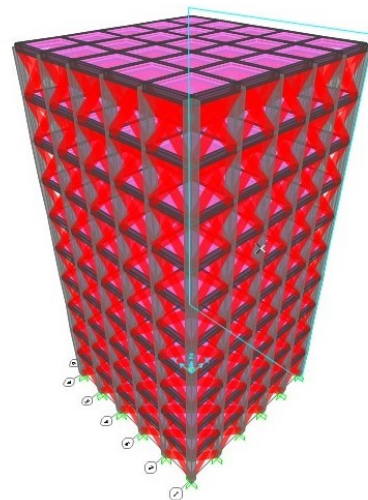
3D view of Brick wall equivalent strut fully infilled building.
